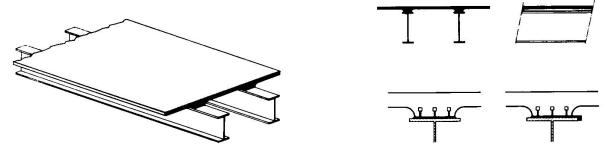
A precast concrete slab precast on two steel plates, with a later welding to the steel structure below.
